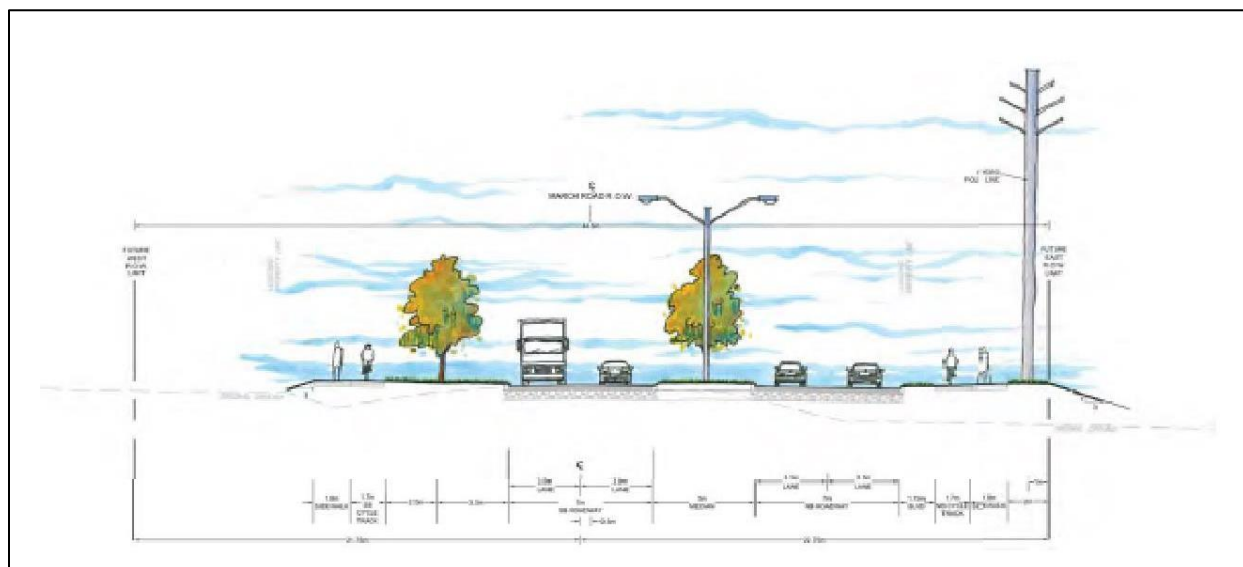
Excerpt from Kanata North Community Design Plan – Cross Section for March Road - Interim.
